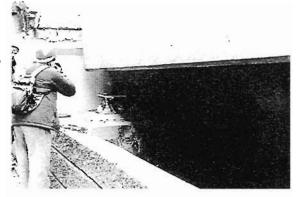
Ramp onto Hanshin Expressway near centre of Kobe: Approximate one metre shift of first ramp span towards the north
